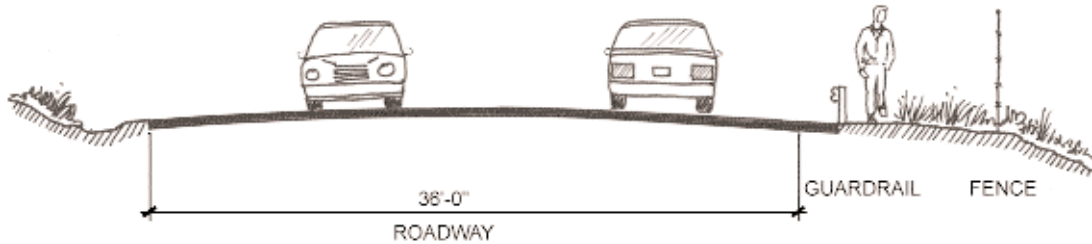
Existing Conditions at Lincoln Boulevard at Crissy Field Avenue
